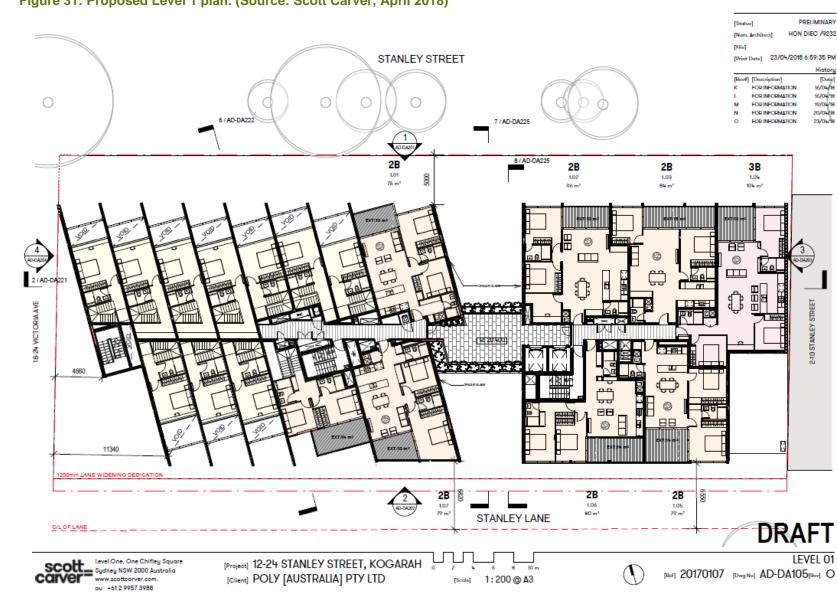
Proposed Level 1 plan. (Source: Scott Carver, April 2018)
